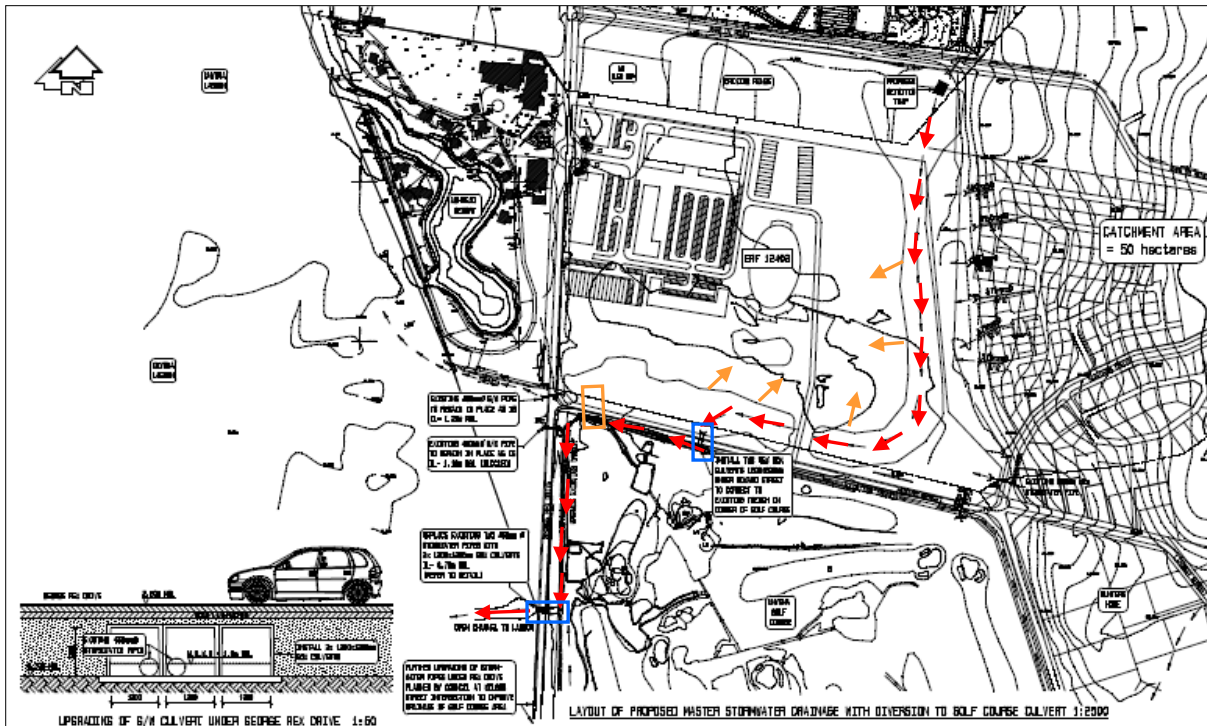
Stormwater drainage plan from Erf 12403 to Knysna Estuary (Niewoudt & Kie, 2018). Red arrows indicate proposed movement of stormwater through existing drainage channel; blue rectangles indicate proposed new culvert or culvert upgrades; and the orange rectangle is an additional culvert recommended in this rehabilitation plan. Orange arrows are locations of ‘slots’ in the drainage channel embankment proposed in this rehabilitation plan.
